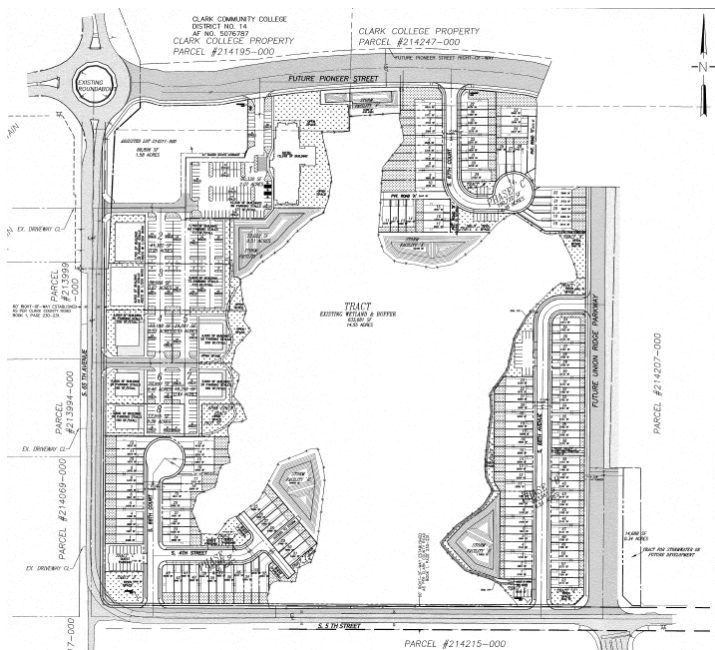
Ridgefield Crossing Mixed Use Master Plan
